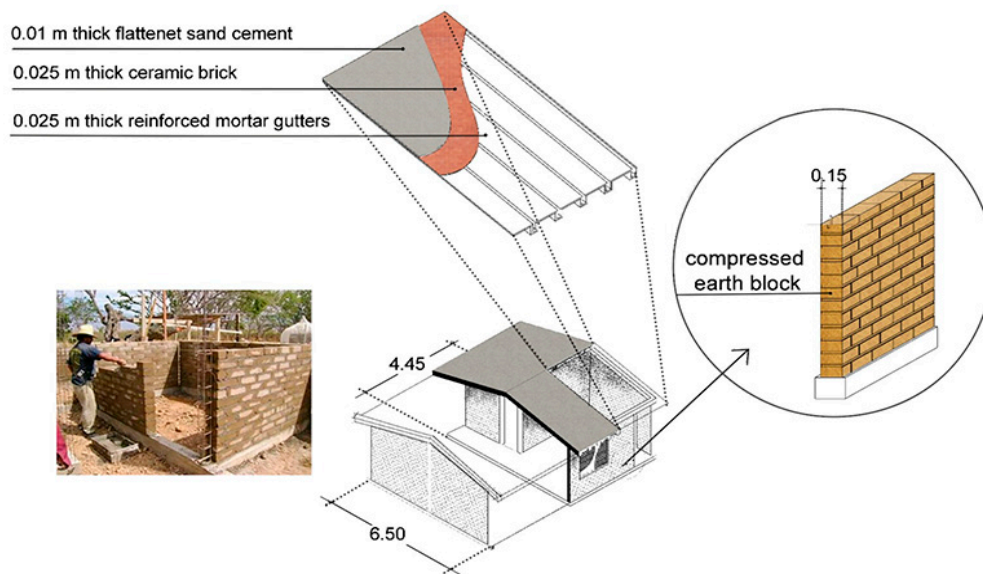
Isometric view of the MBSCLM house with compacted soil block walls and a reinforced mortar slab.
